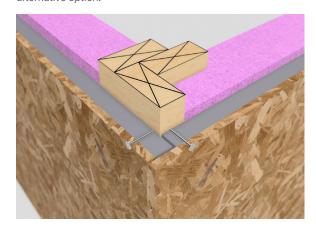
Installing LP NovaCore panels at outside corners alternative option.
